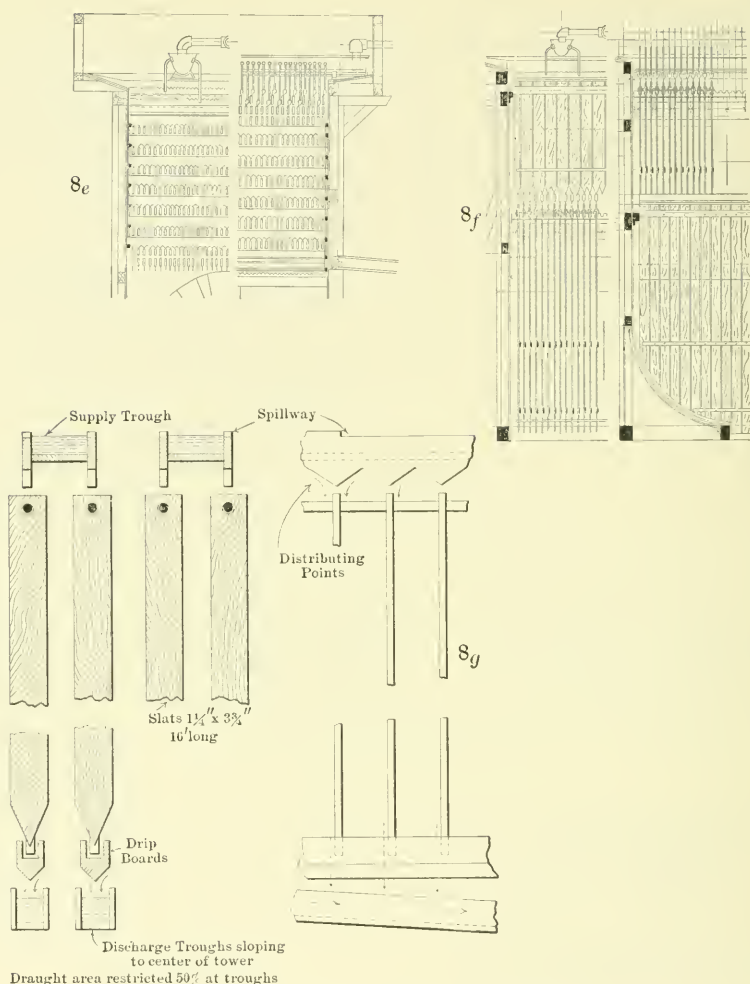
e, f, g TYPES OF COOLING SURFACES
